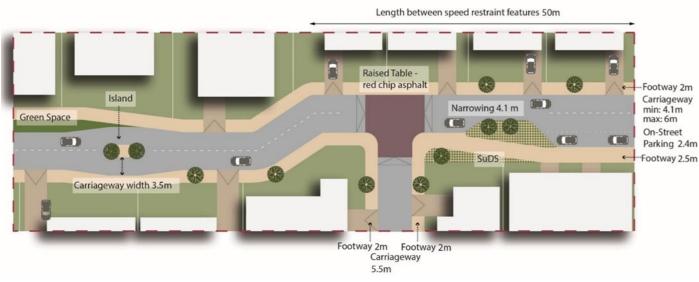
Street Typology Plan for a Residential Connector Street in an Urban Context
